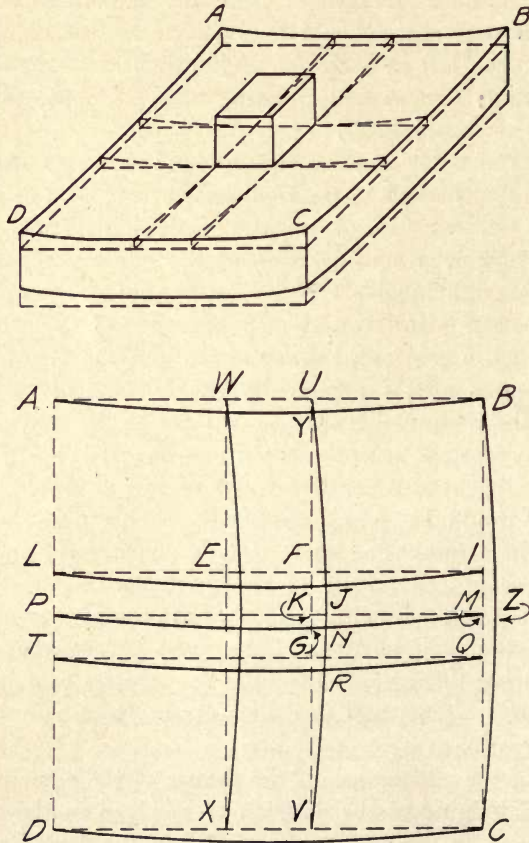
FORM TAKEN BY COLUMN FOOTINGS UNDER LOAD.
